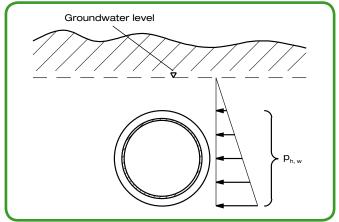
Load resulting from hydrostatic pressure resulting from groundwater above pipe level (e.g. for pipes installed below groundwater horizon)
